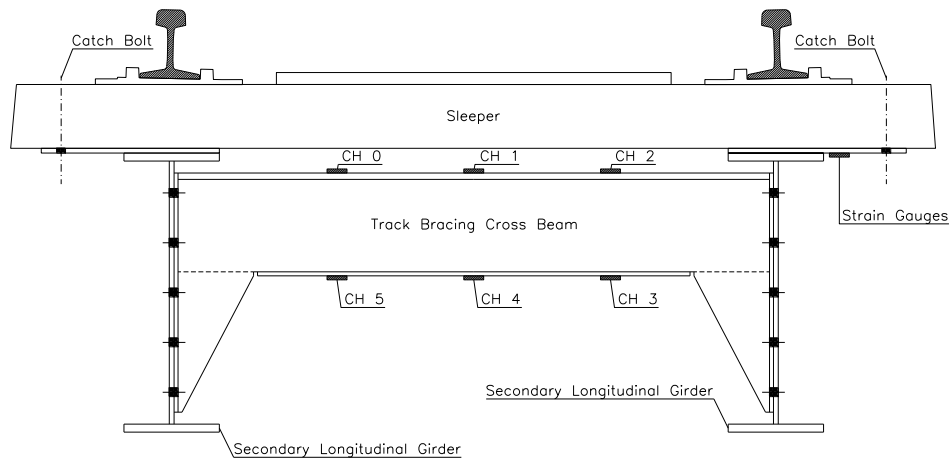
Strain gauge position on track bracing cross beam and sleeper supporting plates.
